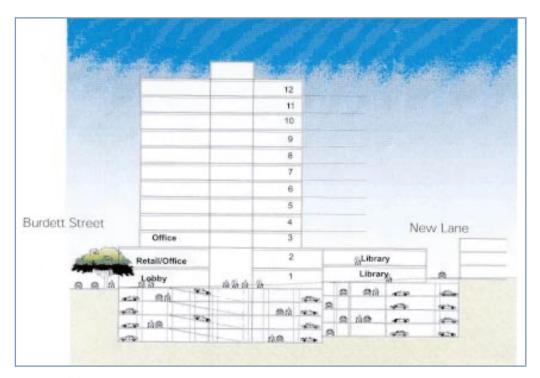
(y): East Precinct public car parking concept plan - redevelopment of Site C.(E)
